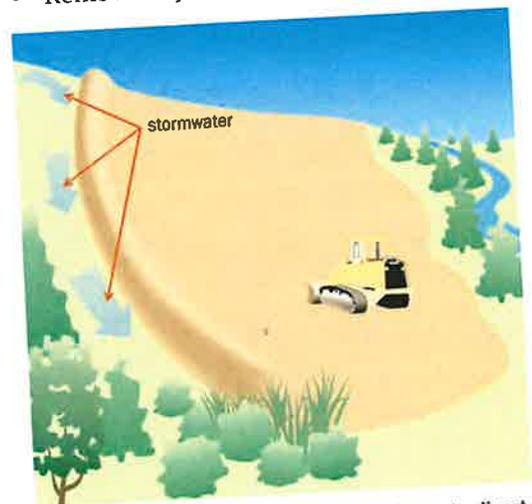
Illustration of a construction berm to divert stormwater away from the disturbed construction area.
